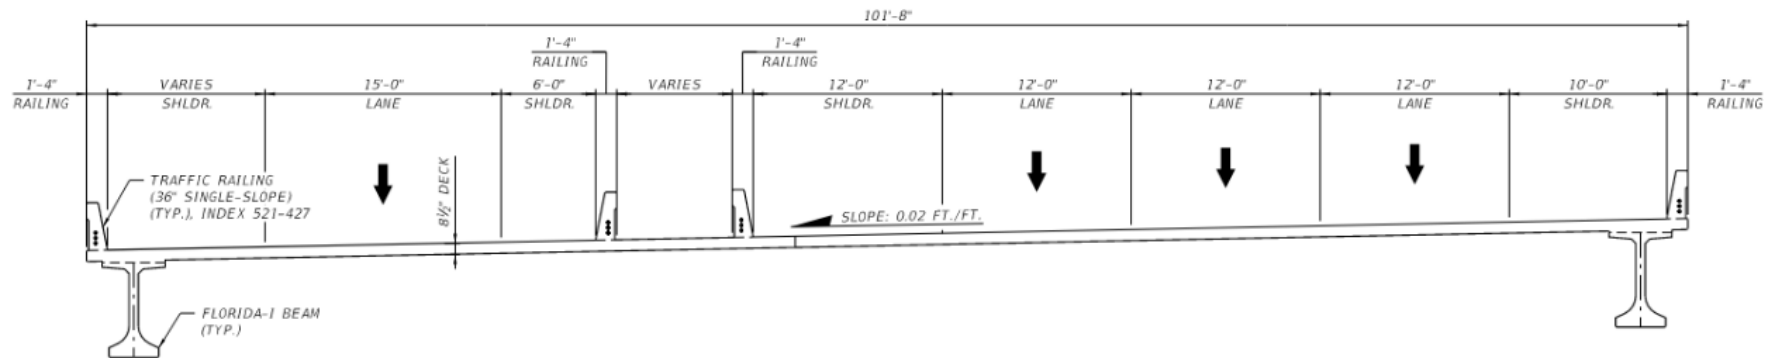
Proposed Southbound I-75 over Moccasin Wallow Road Bridge Typical Section
